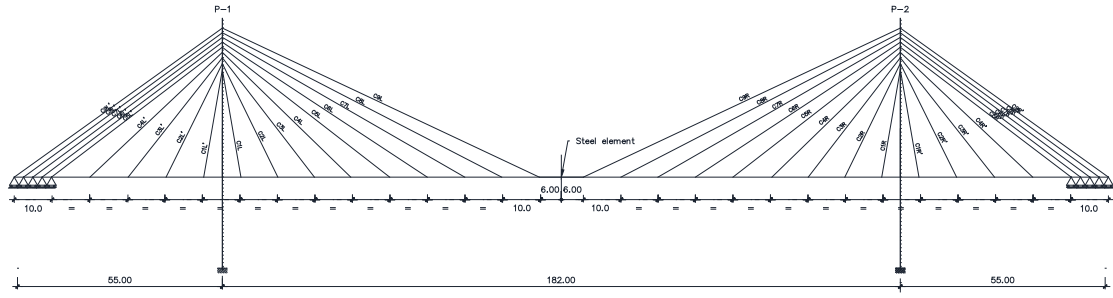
Longitudinal scheme of the full scale model (units in m).
